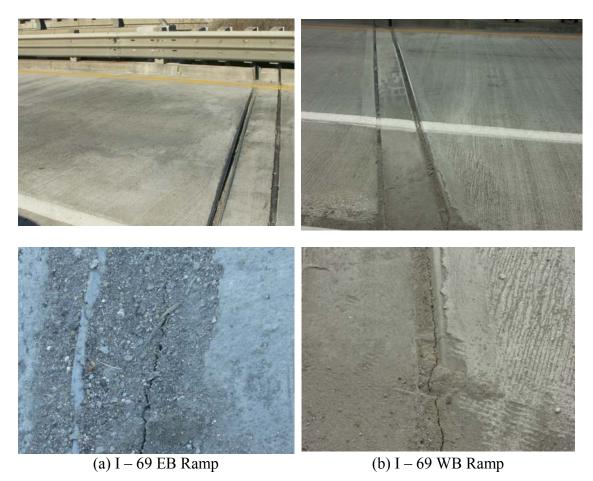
Expansion joint condition of I-69 (a) EB ramp and (b) WB ramp
